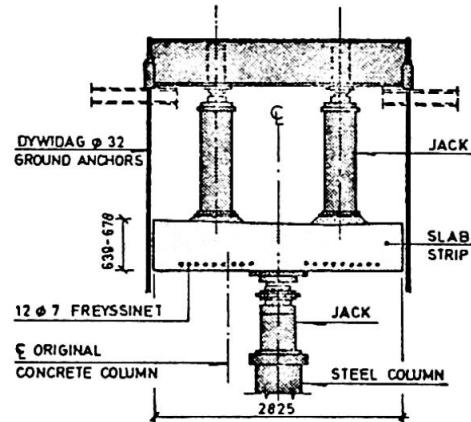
Slab strip. Cross section at midspan. Load arrangement
